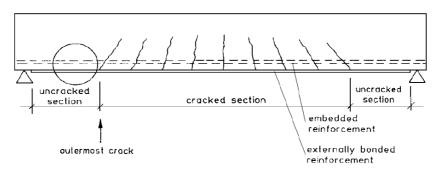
Anchorage zone beyond location of last crack [7, p.54]
